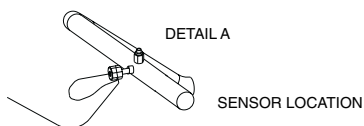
Typical Control Mounting Location for Sizes 010-030 (Sizes 022-030 Shown)
